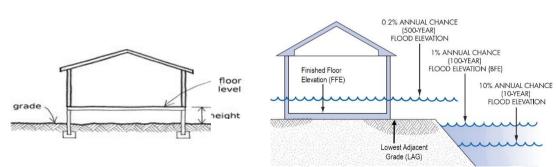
First Floor Height (see https://alabasterlandsurveying.com/elevation-certificate.
